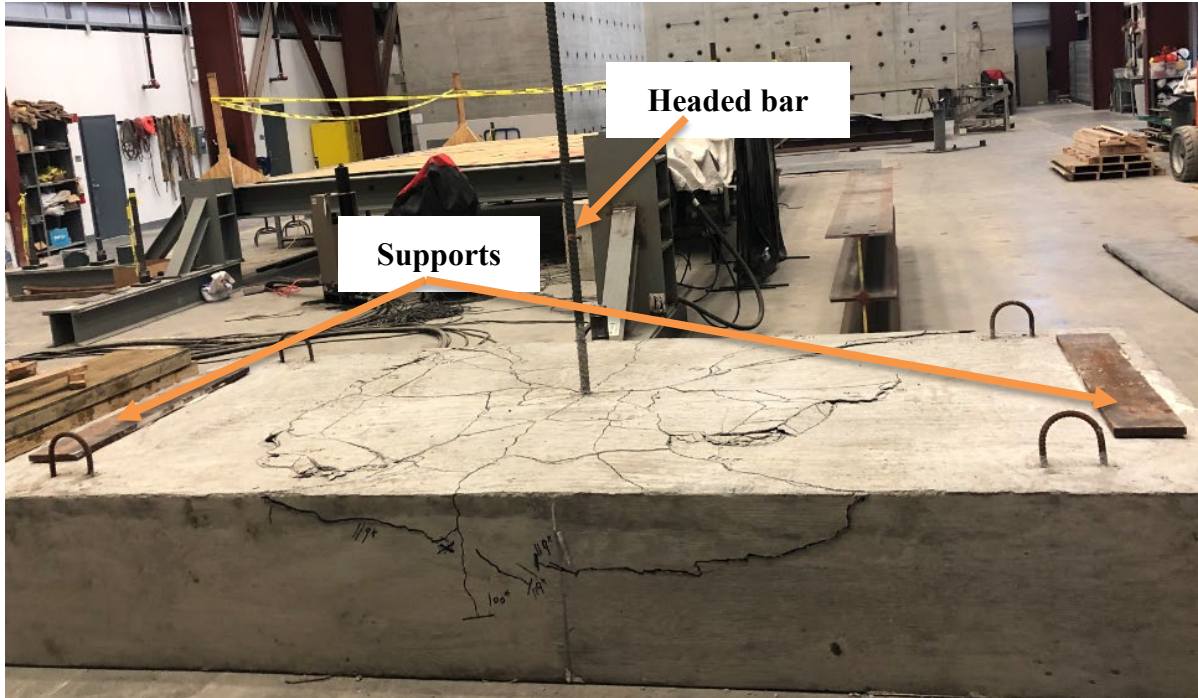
Concrete breakout failure of Slab Specimen 3 (11-5-S5.5-6#11-0-12.75) with both support reactions placed far away from anticipated failure region (test had one headed bars without parallel tie reinforcement)
